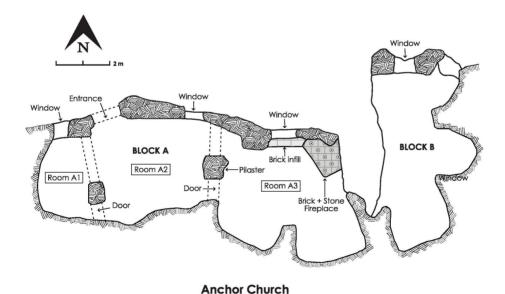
Sketch plan of Anchor Church showing blocks and rooms.
